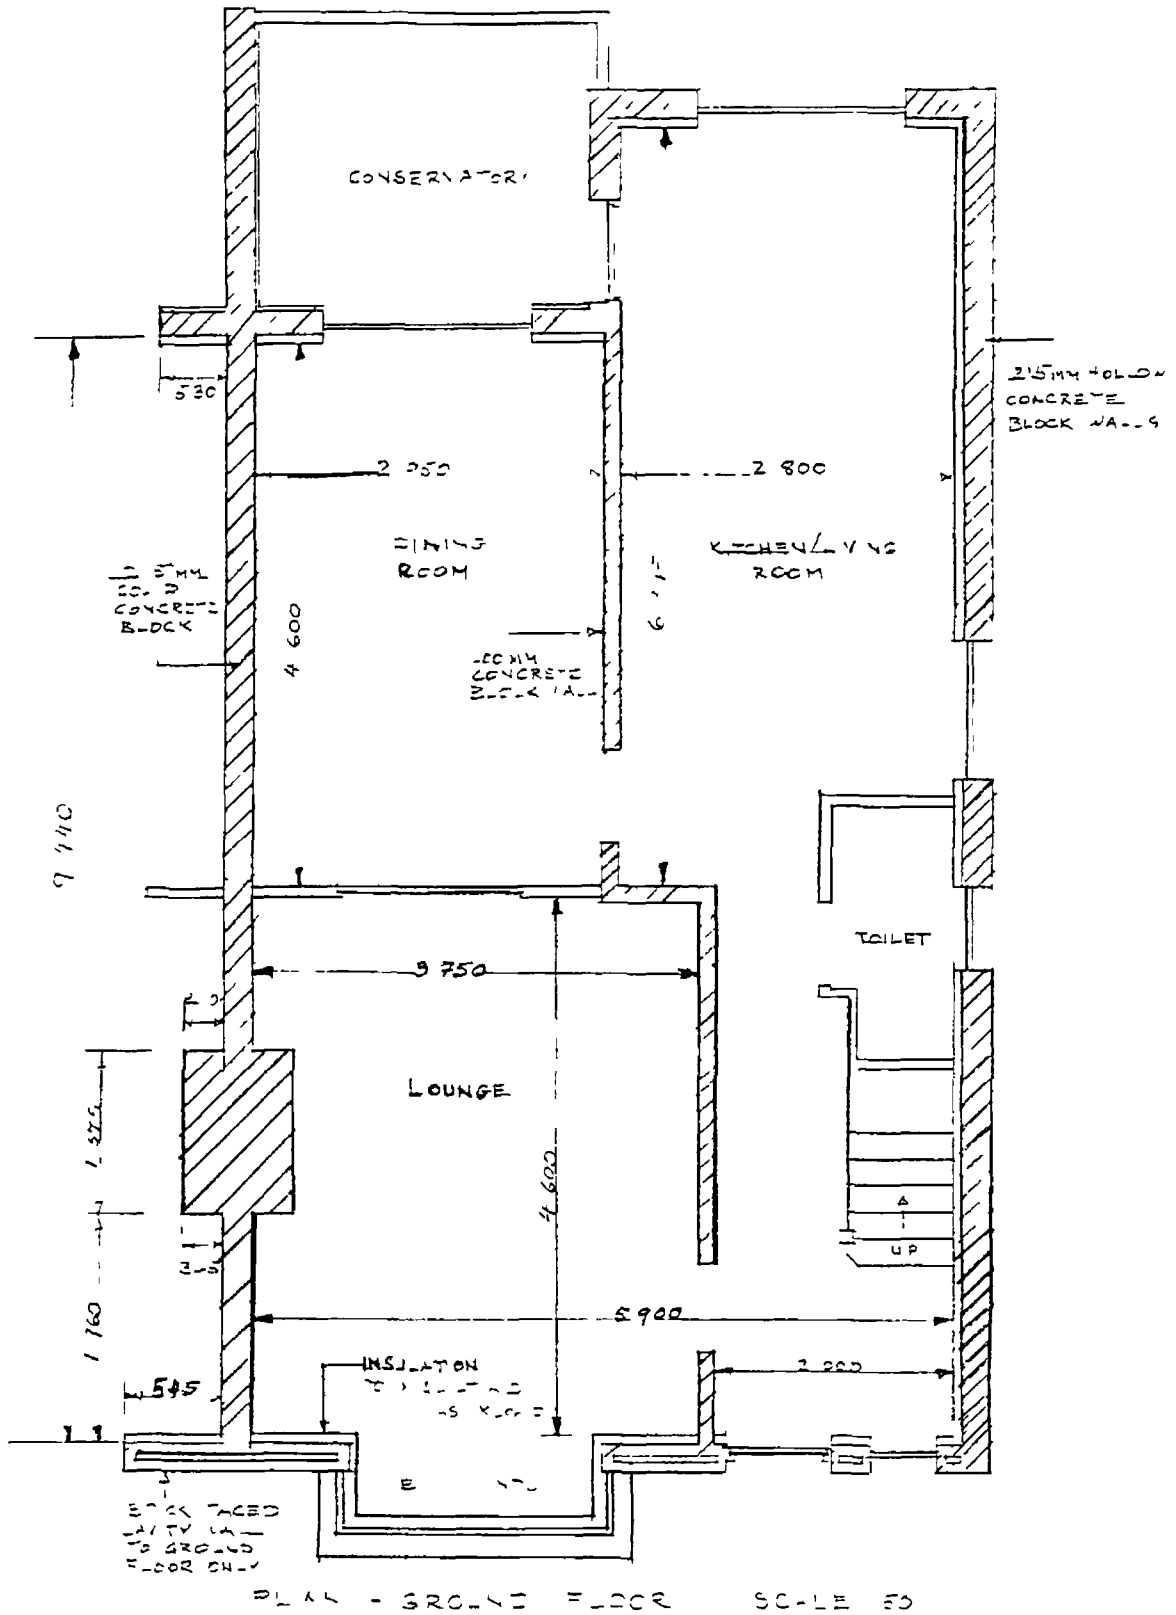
2 2: Semi-Detached House Ground Floor Plan
